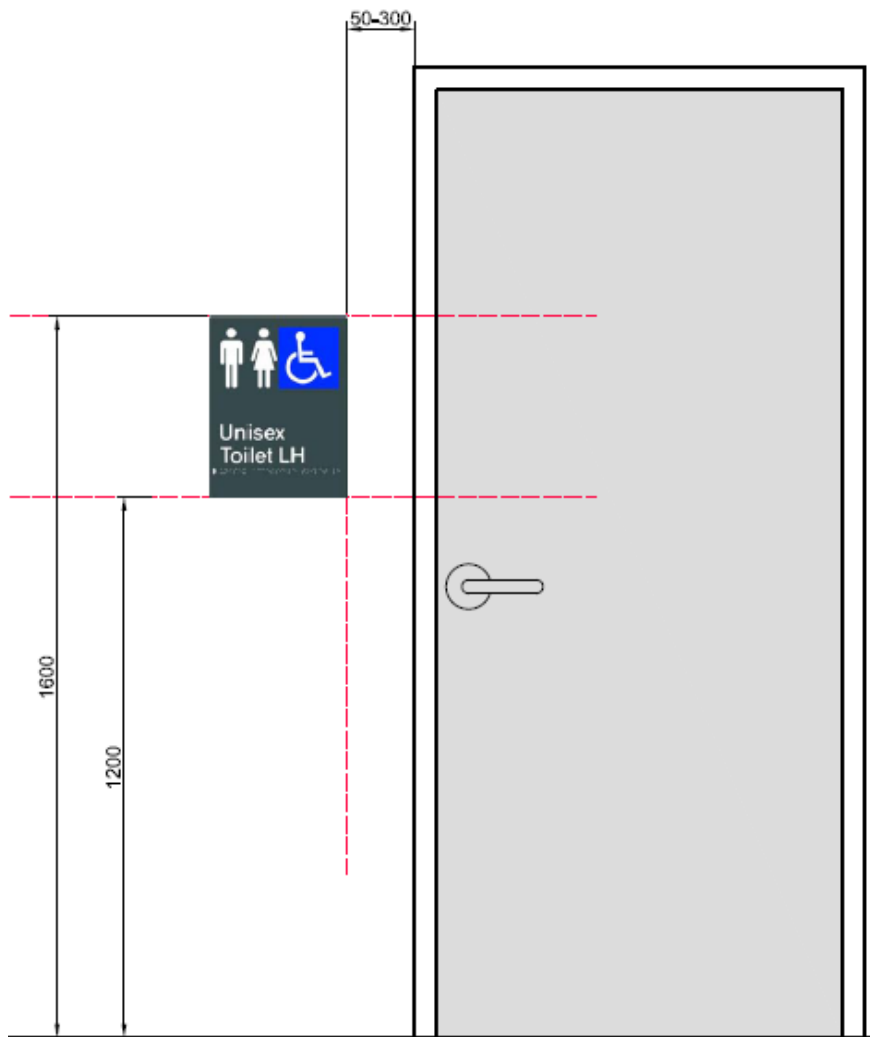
Elevation setout of Braille Tactile signs adjacent to doors
